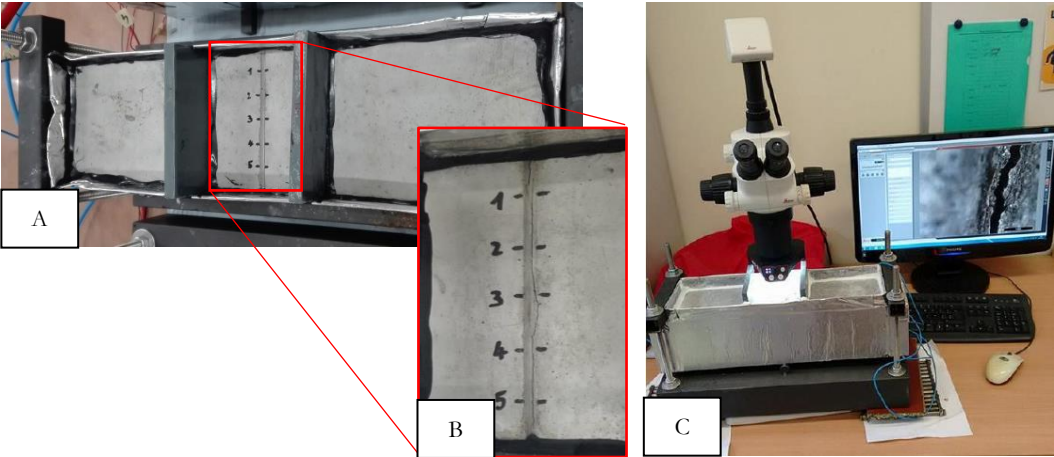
CRACK WIDTH MEASUREMENT OF THE CONCRETE BEAMS
